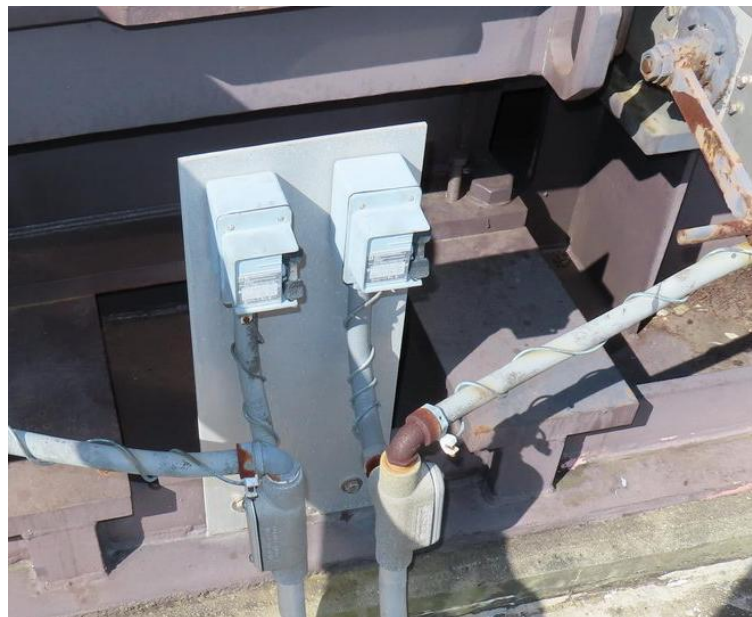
Two small disconnect switches used for motor and machinery brakes. The switches have minor corrosion, and the levers are difficult to operate due to the corrosion.
